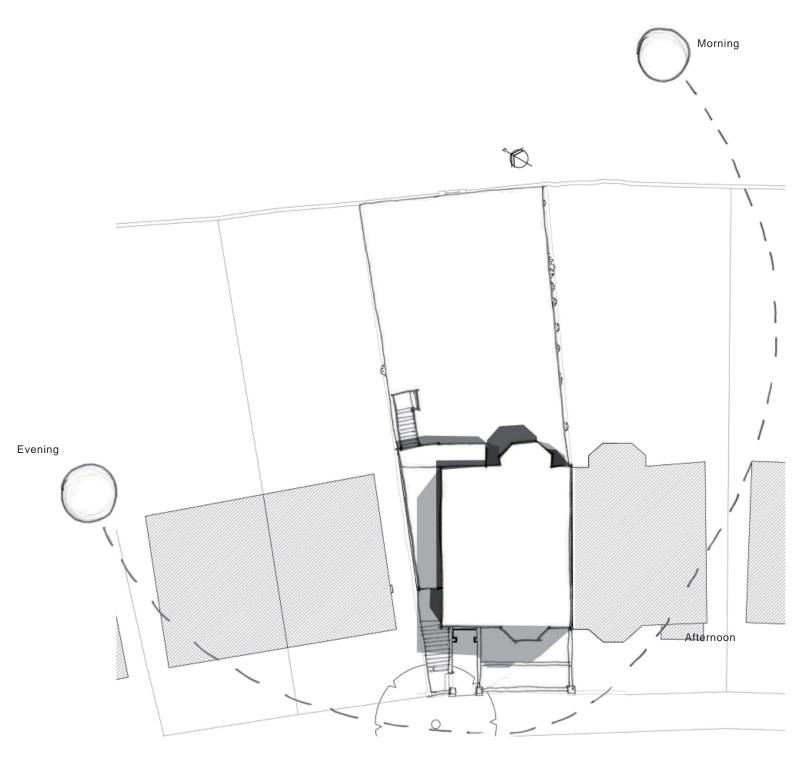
Sunlight - The lower ground floor extension has no impact on neighbouring properties
